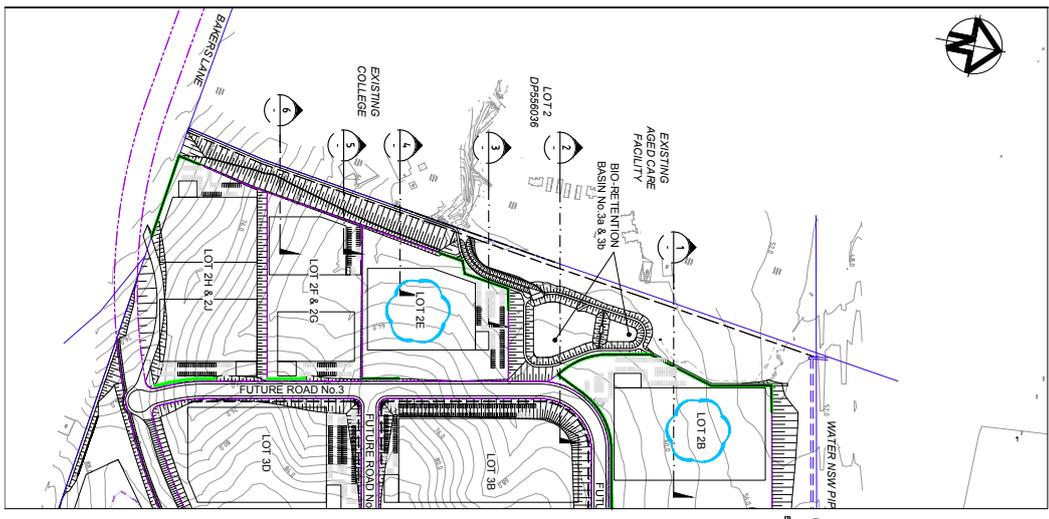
SKC157 - WESTERN BOUNDARY LAYOUT AND SECTIONS[P1] (Source ATL 2018)
